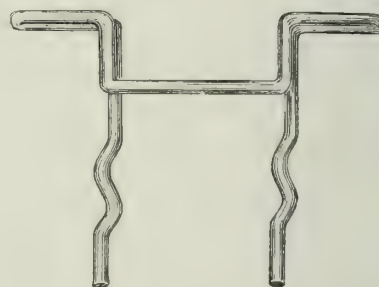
DETAIL OF GRIP-TITE FLOOR ANCHOR HOLDING NAILING STRIP
